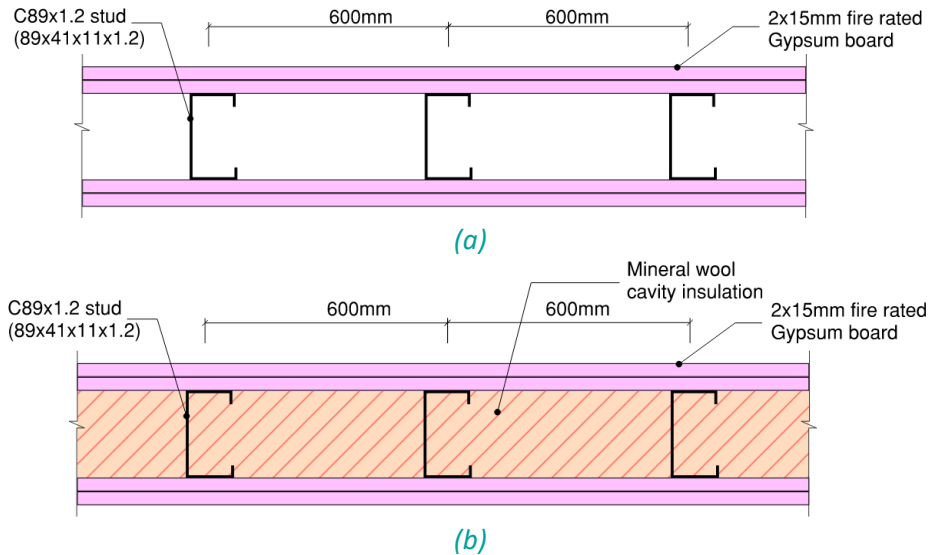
Section of tested LSF wall (a) without insulation (b) with cavity insulation
